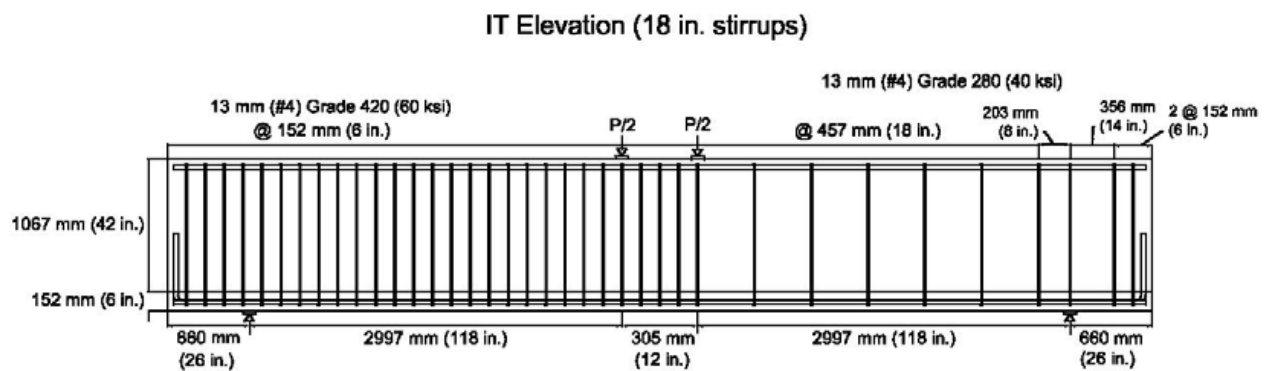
Specimen Elevation View with Internal Steel Reinforcing (Goebel et al., 2012).
